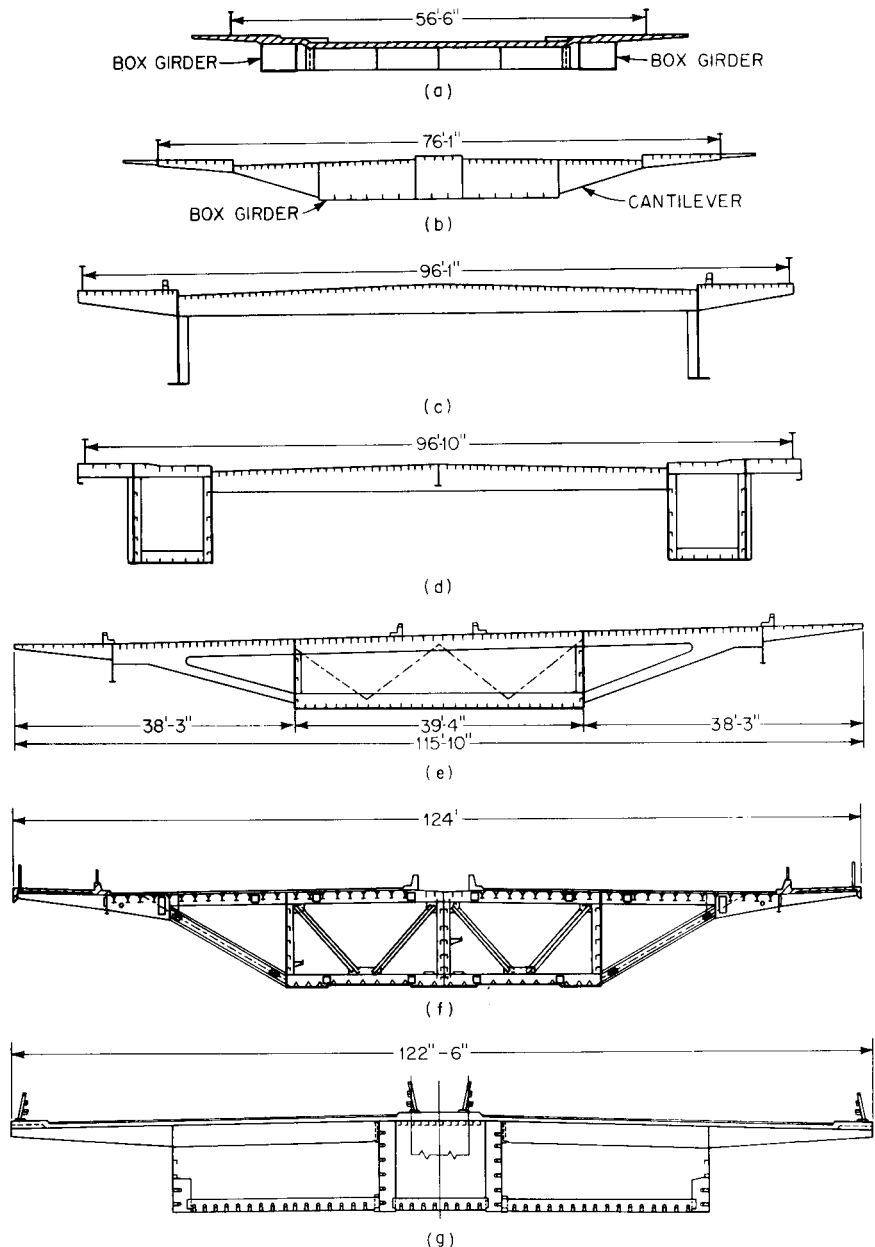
Typical cross sections of cable-stayed bridges: (a) Büchenauer Bridge with composite concrete deck and two steel box girders, (b) Julicherstrasse crossing with orthotropic-plate deck, box girder, and side cantilevers. (c) Kniebrücke with orthotropic-plate deck and two solid-web girders. (d) Severn Bridge with orthotropic-plate deck and two box girders. (e) Bridge near Maxau with orthotropic-plate deck, box girder, and side cantilevers. (f) Leverkusen Bridge with orthotropic-plate deck, box girder, and side cantilevers. (g) Lower Yarra Bridge with composite concrete deck, two box girders, and side cantilevers. (Adapted from A. Feige, "The Evolution of German Cable-Stayed Bridges—An Overall Survey," *Acier-Stahl-Steel* (English version), no. 12, December 1966 reprinted in the *AISC Journal*, July 1967.)
